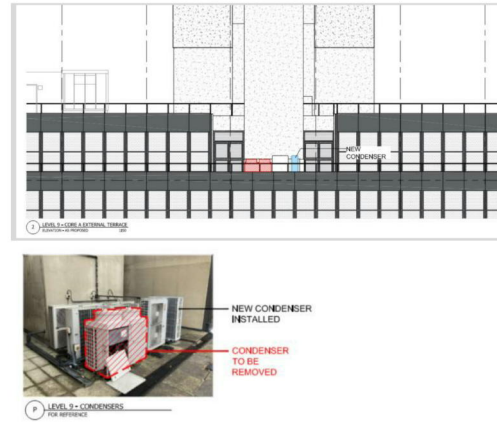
2 Proposed plans for Level 9 Core A terrace (Source: Overbury Planning Issue Drawing 3147-P7-2905 P1)
